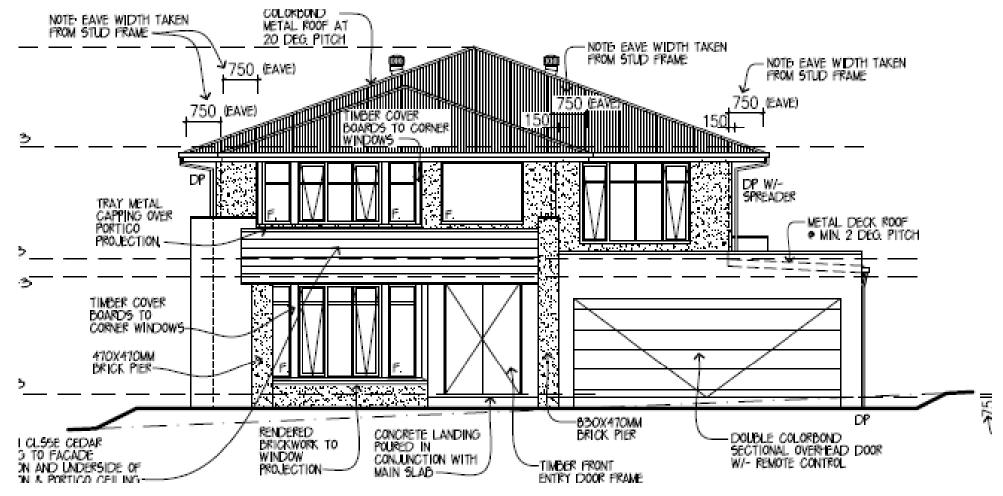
Front (east) elevation (Source: Metricon Homes, 2020)
